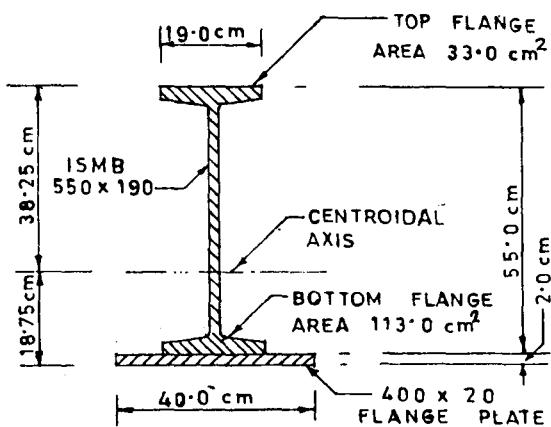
COMPOUND STEEL SECTION (Ex. 15.1)
